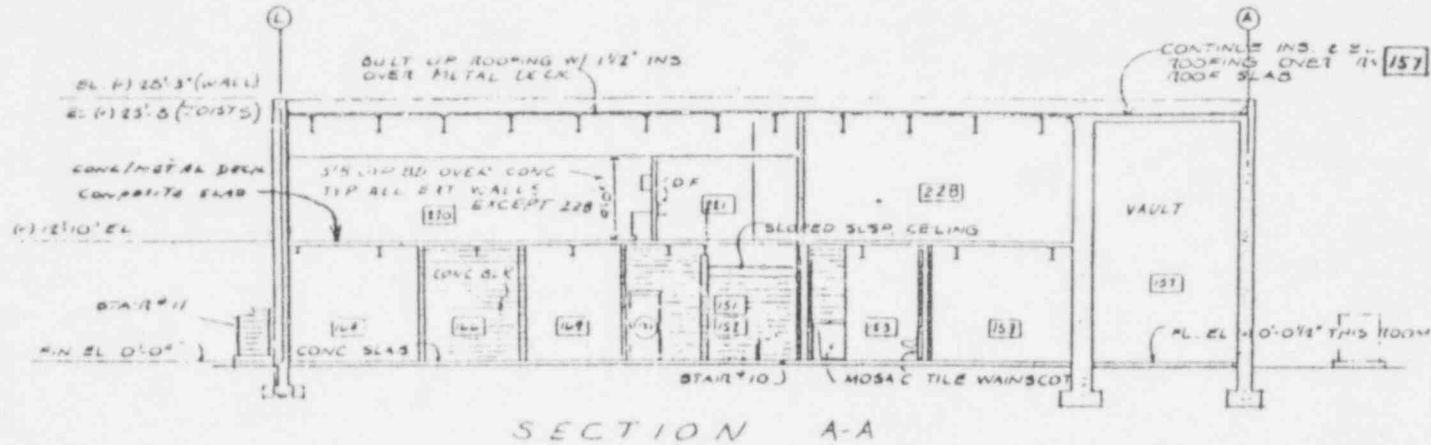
(a) BUILDING SECTION (EAST-WEST)
